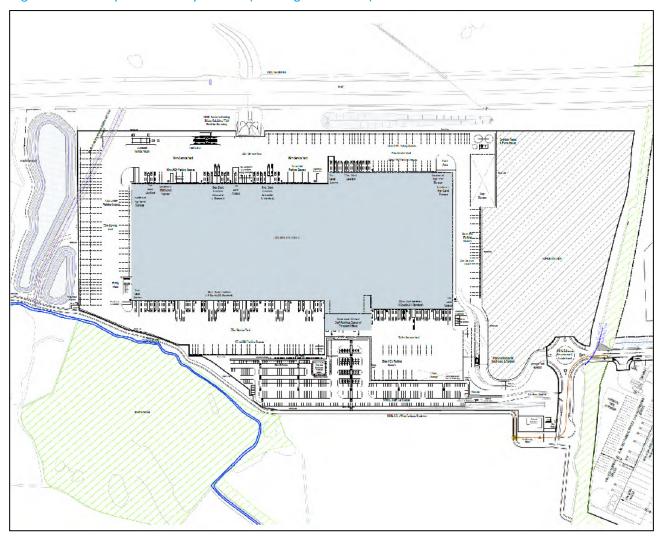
Development Site Layout Plan (Drawing 6385-181-E)
